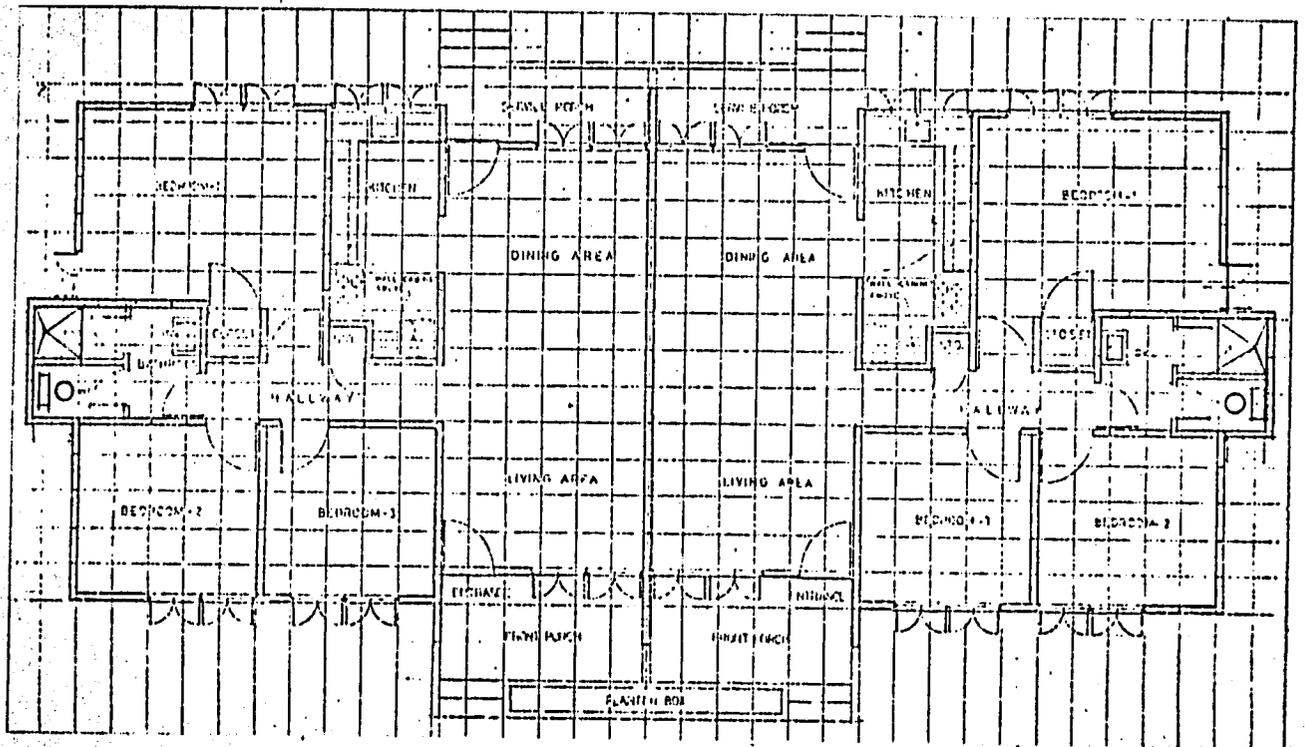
Tolbert Estates. Plan of Norwegian panel houses, a modification of the NHA design shown shown in Fig. 25. Latest plan for these houses reduces area of the three bedroom unit to 640 square feet.
